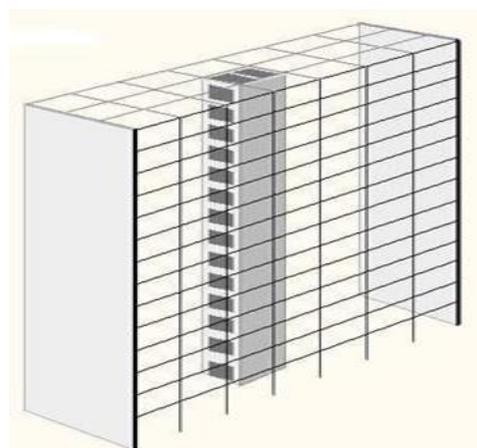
2D wireframe of a building along with shear walls on the ends
